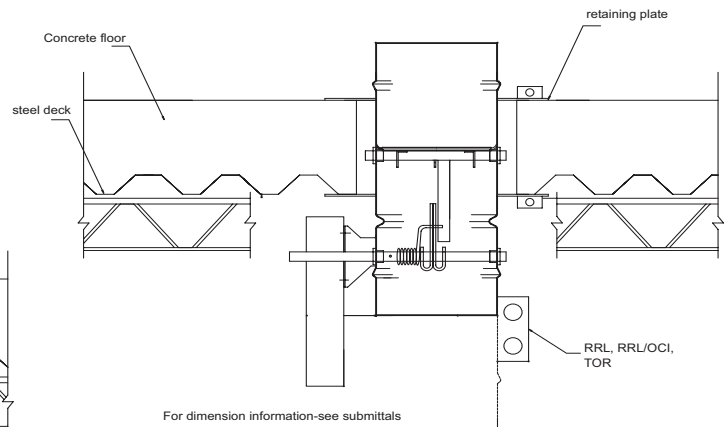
Damper installed in concrete floor with steel deck with actuator below the floor.
